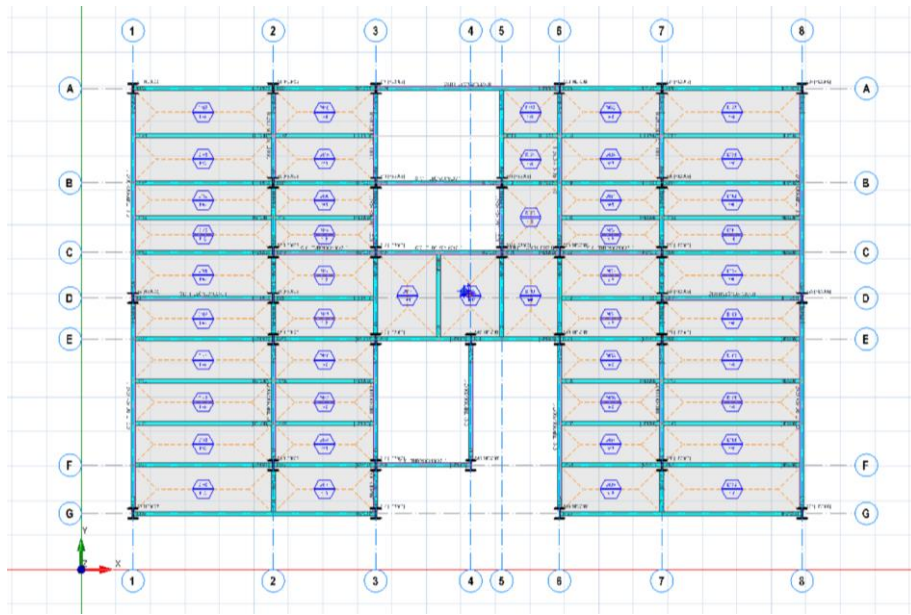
Floor Plan of SS14 Model in ProtaStructure
